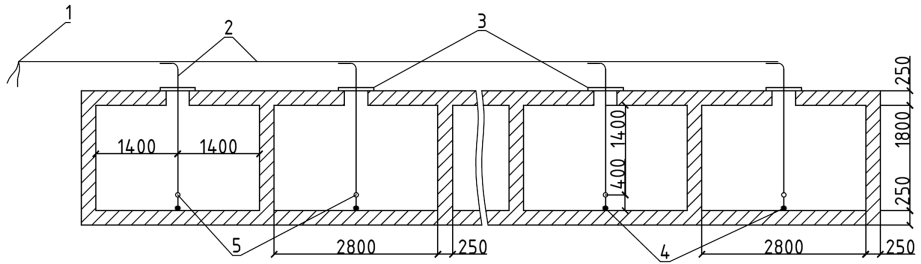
Layout of hydro-blasting operations during the reinforced concrete container demolition 1 – electric detonator; 2 – detonating cord; 3 – fixing rods for DC hanging; 4 – load; 5 – blasting material charge.
